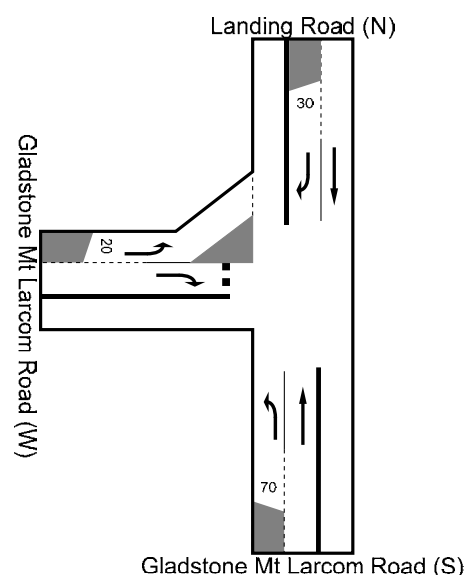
Existing Gladstone-Mt Larcom Road/Landing Road intersection
